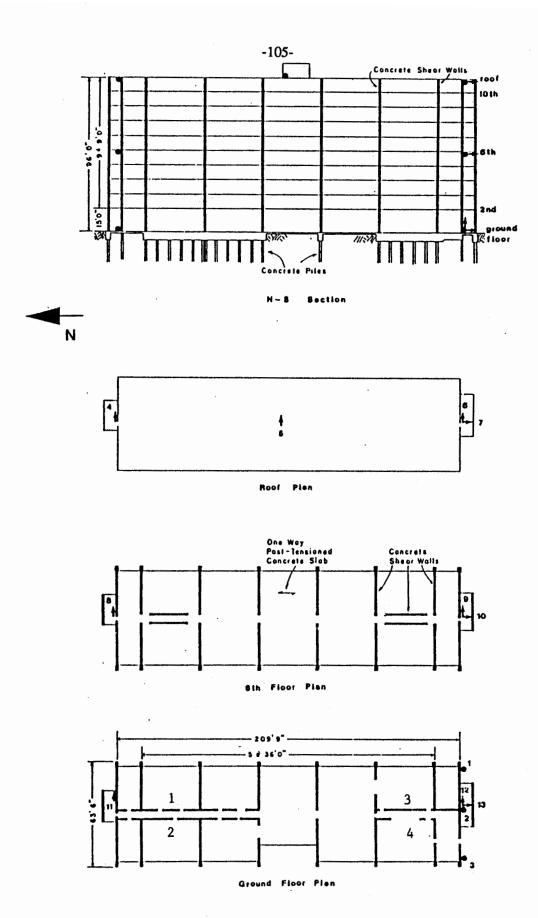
General Layout of Building CSMIP356 (Shakal, et al., 1989)
